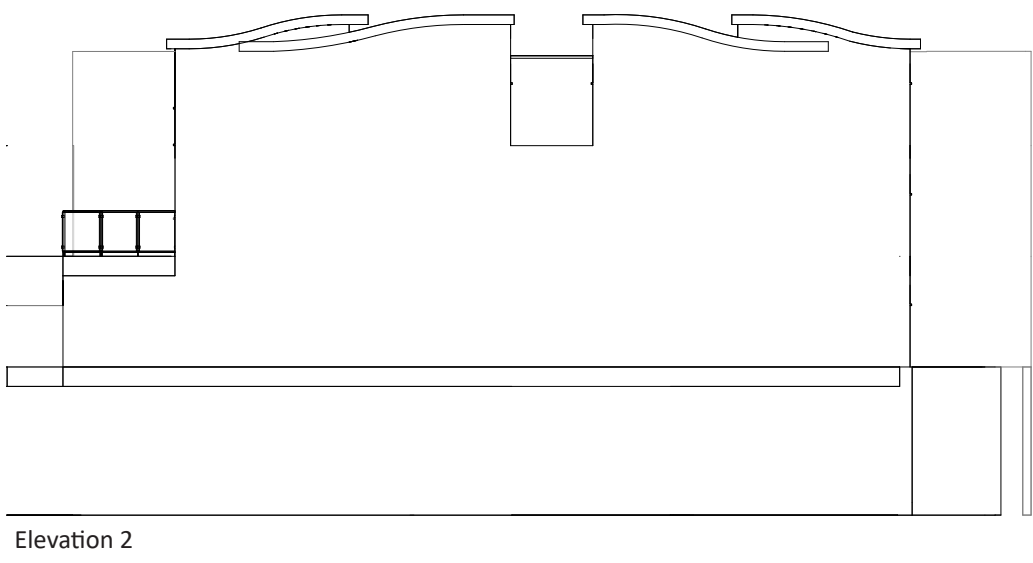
BLOCK 2 MAISONETTES PROPOSED ELEVATIONS
